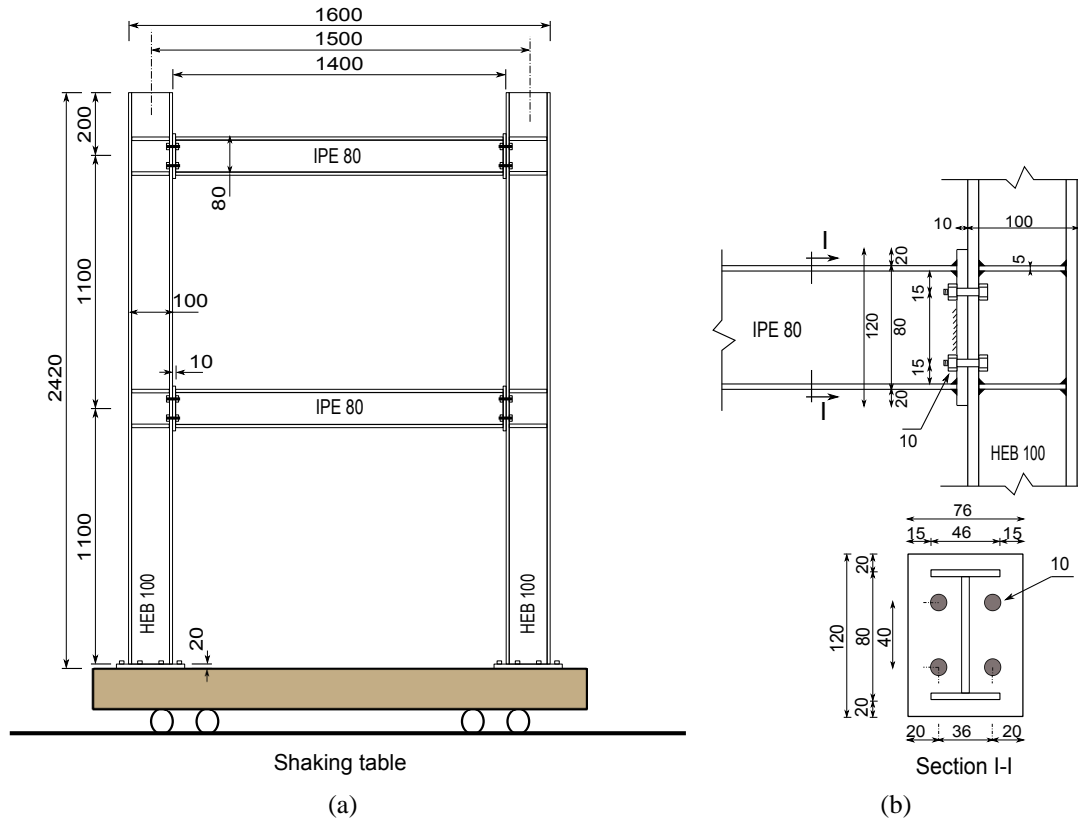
Steel portal frame test set-up details (in mm): (a) details of the portal frame; (b) details of the bolted connection.
